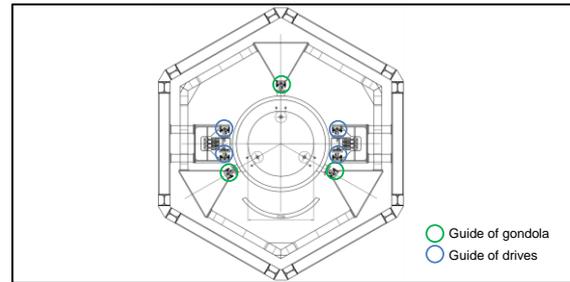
Top view of tower-in-tower structure with gondola, drives and guides
